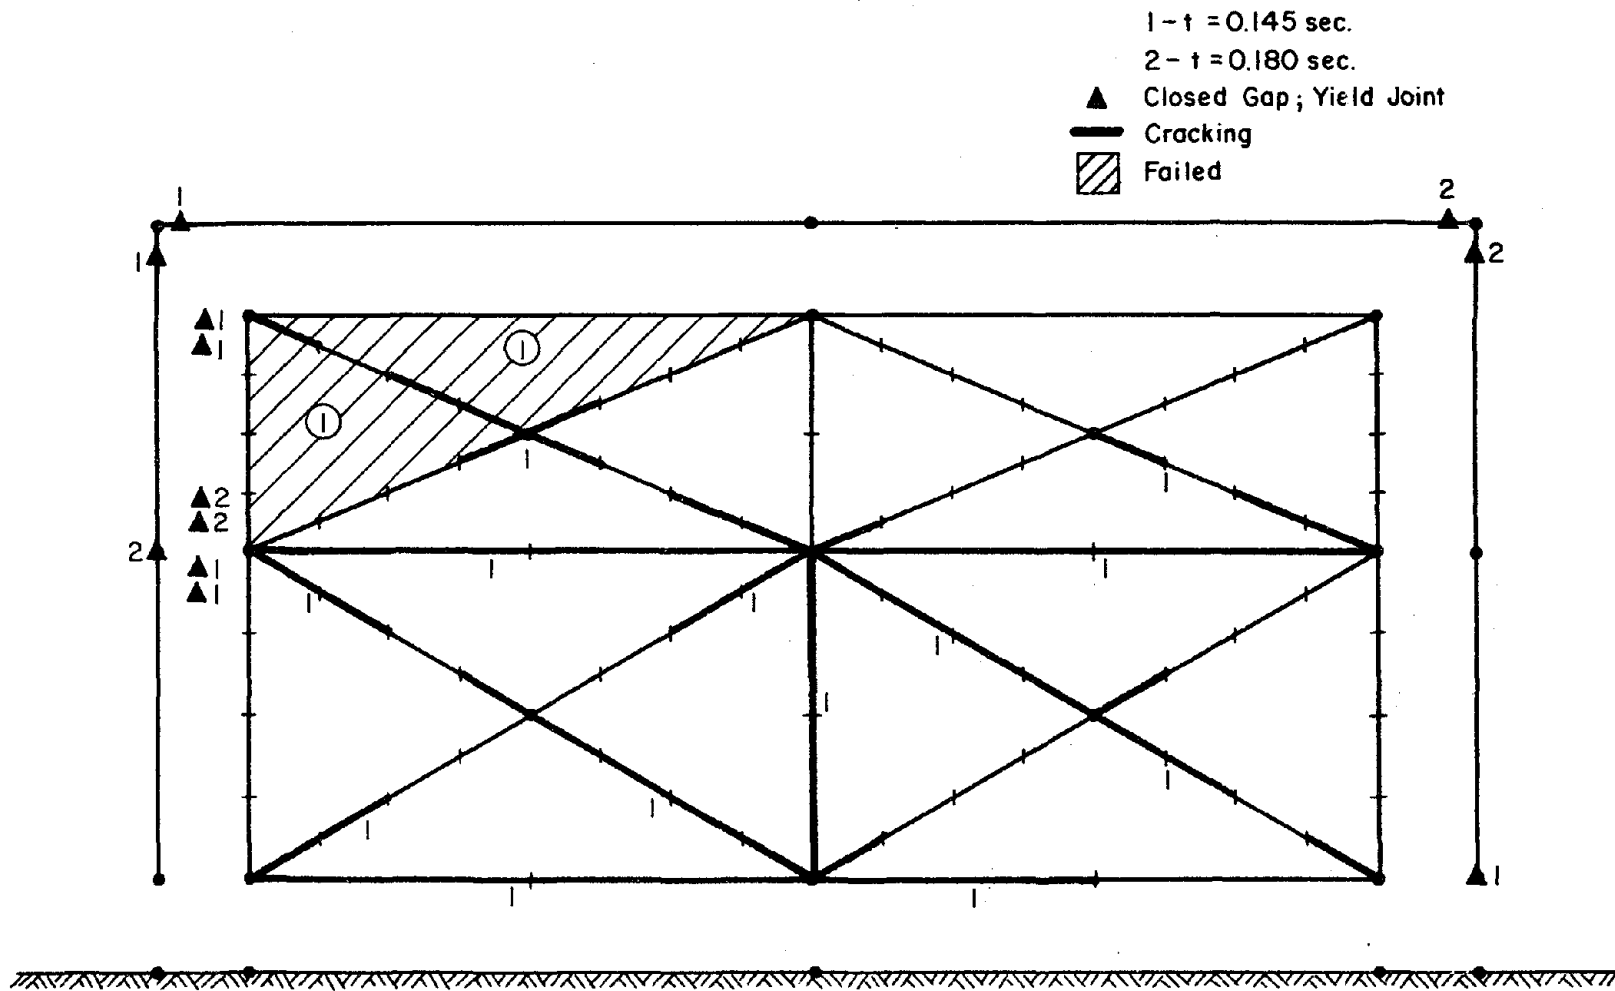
Cracking Sequence: Frame Wall-Gaps(I) from t=0.145 to 0.180 sec
